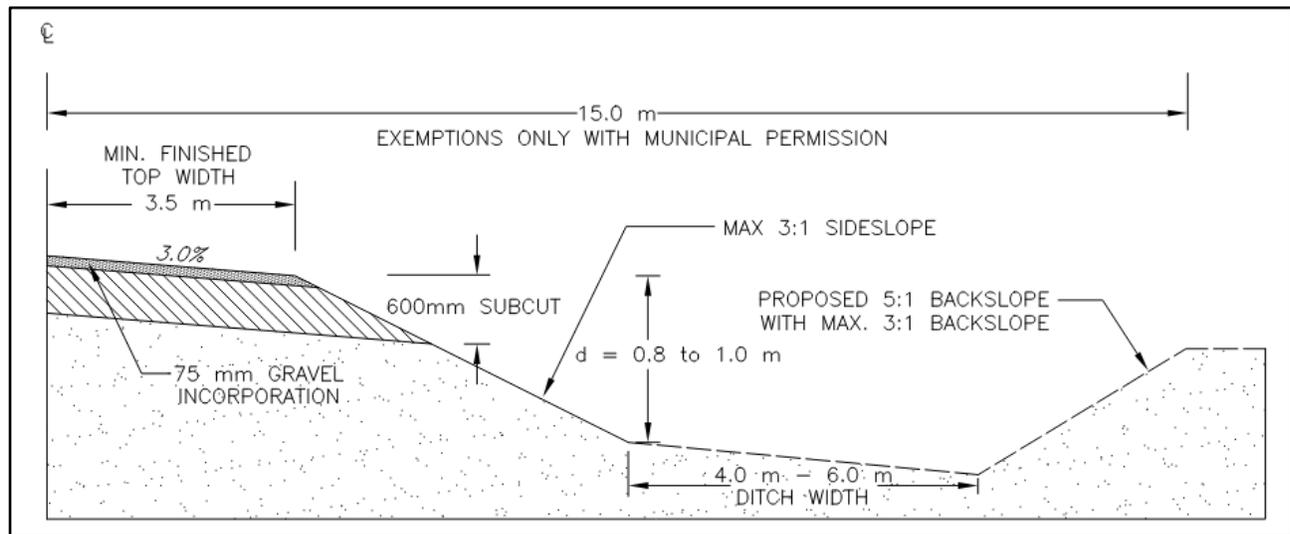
All Weather Gravel Access - Typical Cross-Section Subgrade
